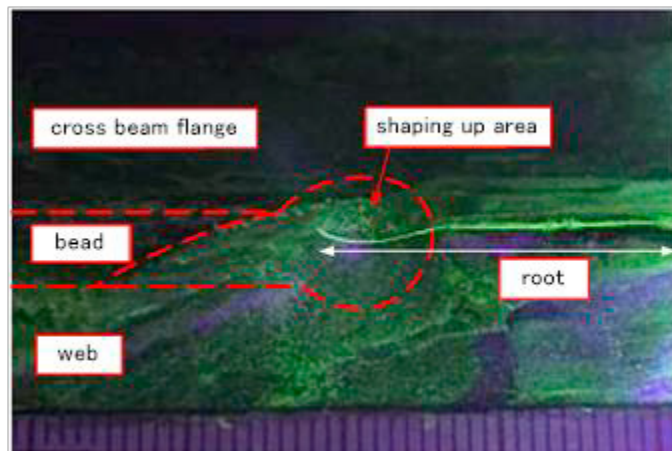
shaping up conditions at the tip of removed weld bead (N=4.0Mcycles, test part B')
